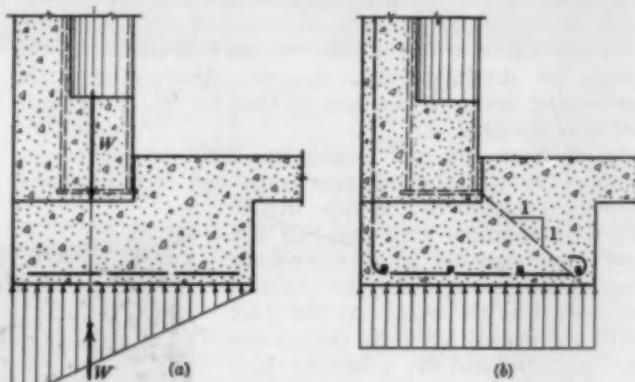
ASSUMPTIONS FOR THE DISTRIBUTION OF PRESSURE UNDER WALL FOOTINGS
